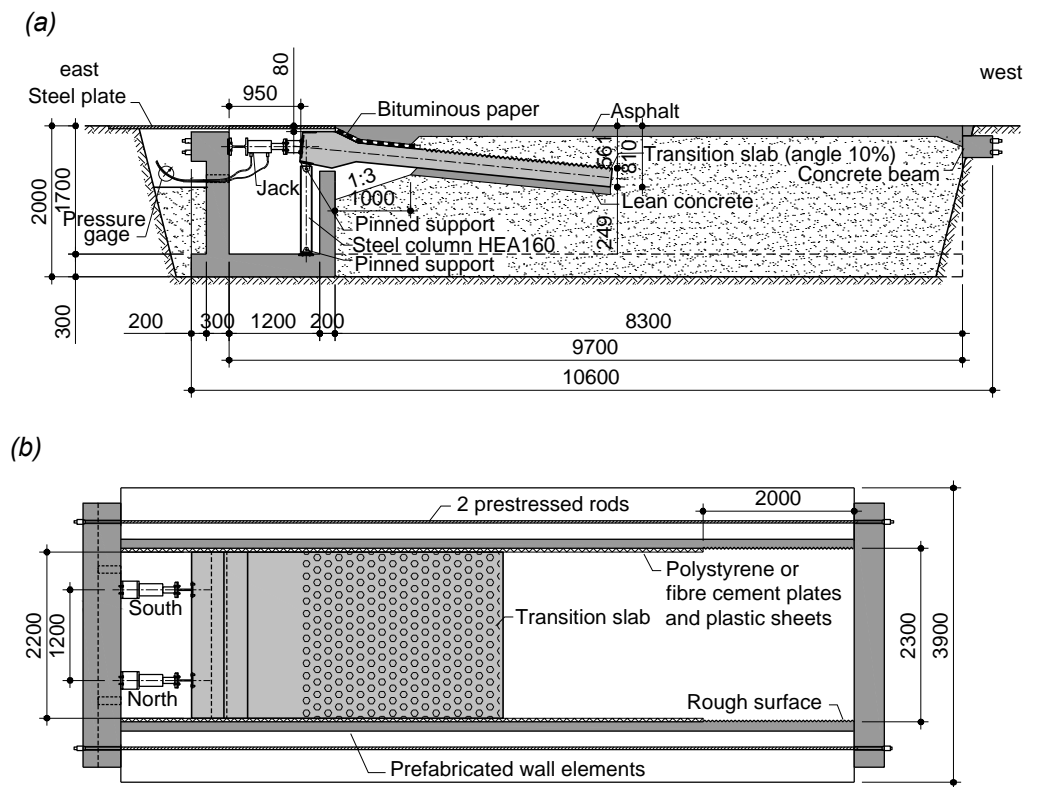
Setup for TST2; (a) Plan view; (b) Longitudinal section
